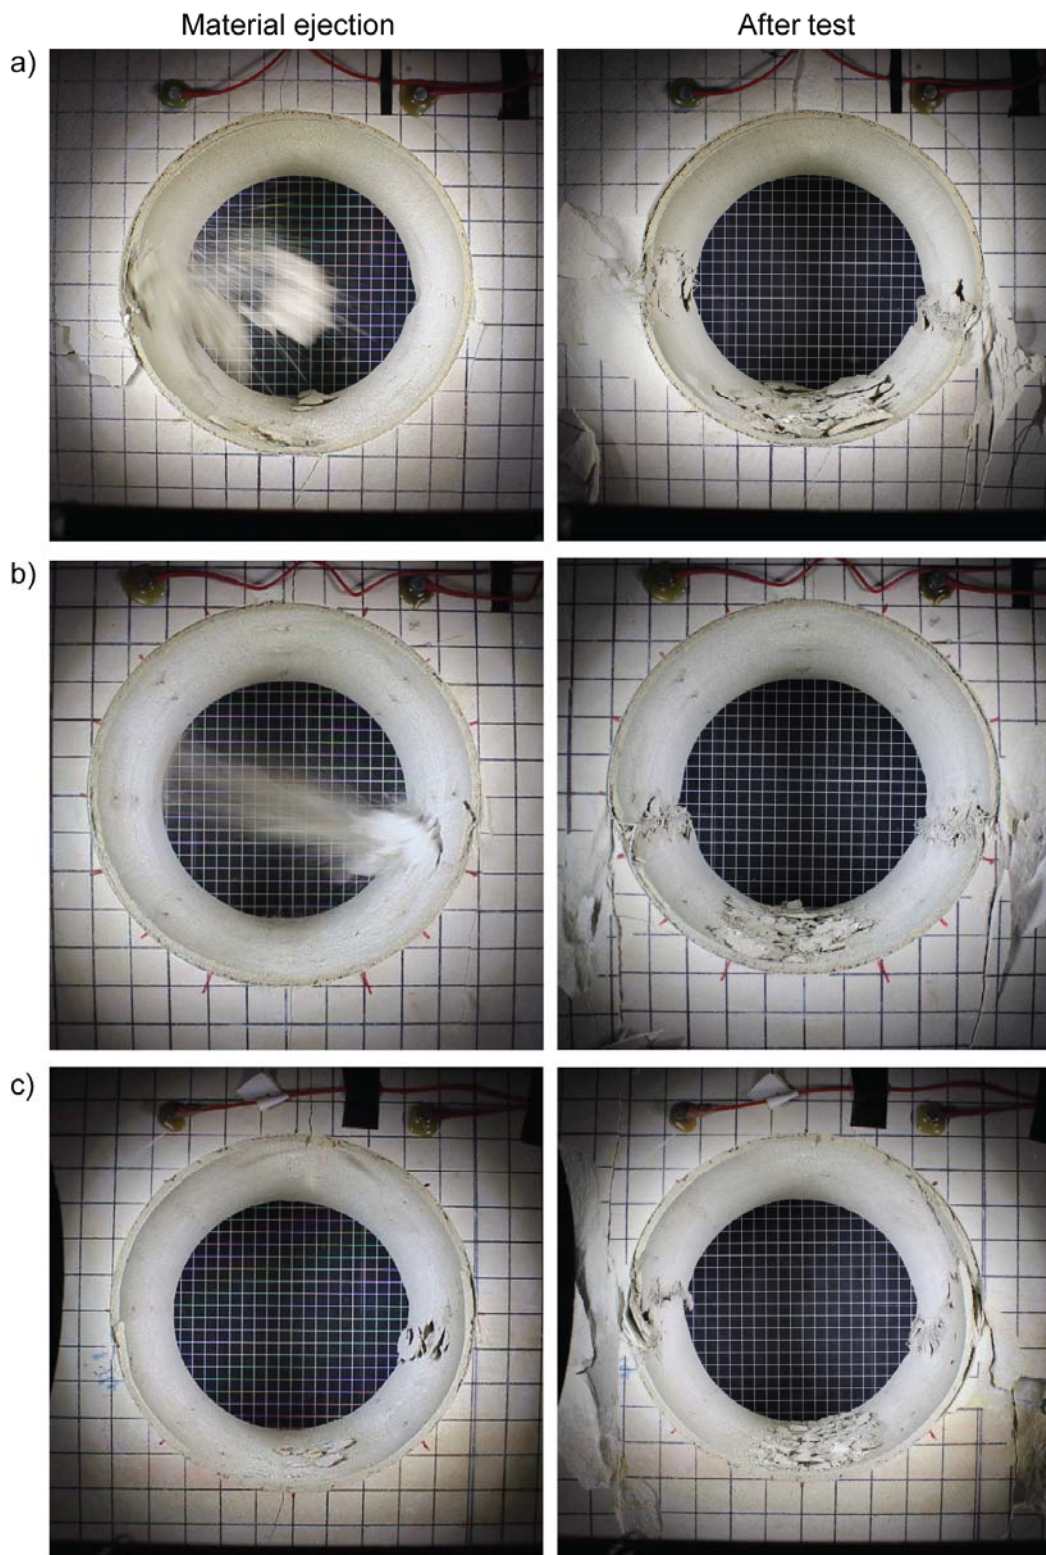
Failure on sidewall at spalling and after pillar failure a) stiff welded mesh (Specimen No.4) b) Wide-aperture stiff mesh (Specimen No.6) c) chain link mesh (Specimen No.8).
